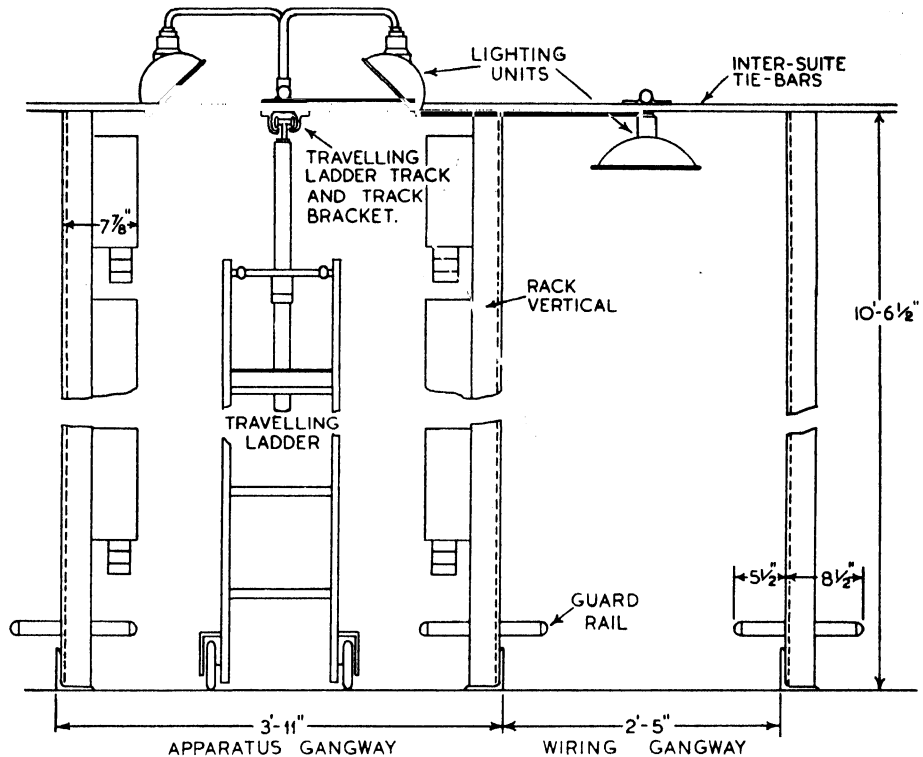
LAY-OUT OF APPARATUS RACKS SHOWING STANDARD SPACING AND LIGHTING
